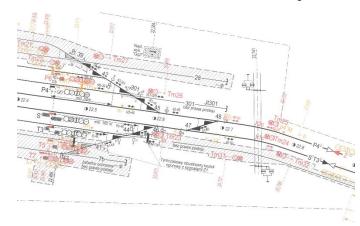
Excerpt of a schematic plan of the signalling equipment
